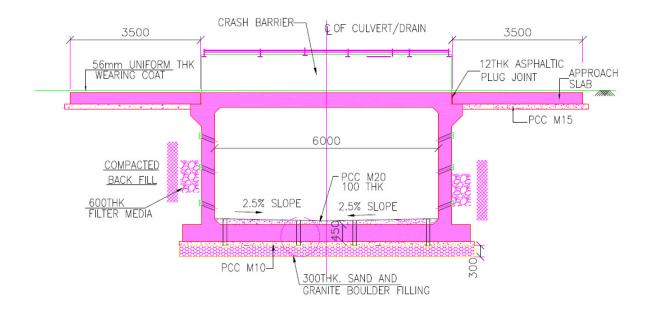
Typical Single Cell RCC Box Culvert
